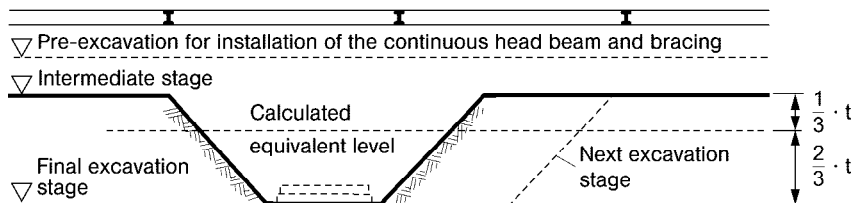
Equivalent excavation level for the intermediate stage with trench
